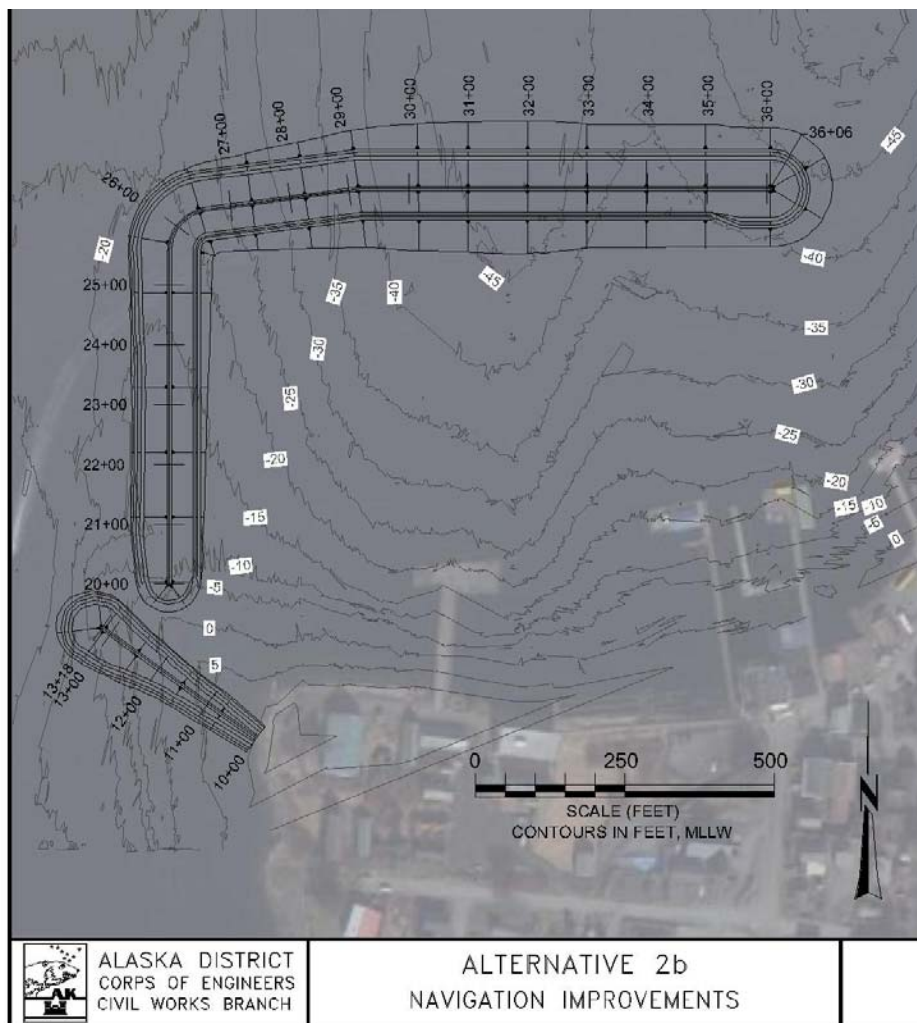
Layout of Alternative 2b, the Tentatively Selected Plan.
